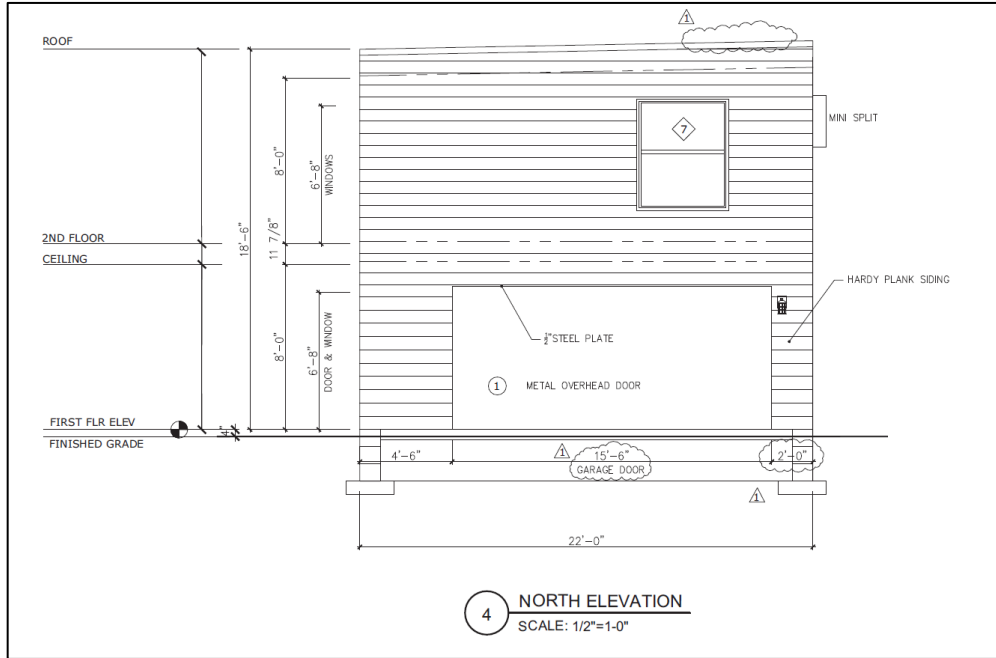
North elevation of proposed garage accessible from east-west alley.
